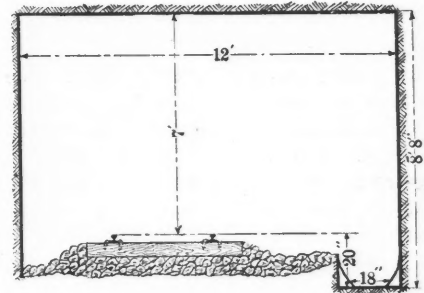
STANDARD SECTION OF TUNNEL AND ROCK PLANE
